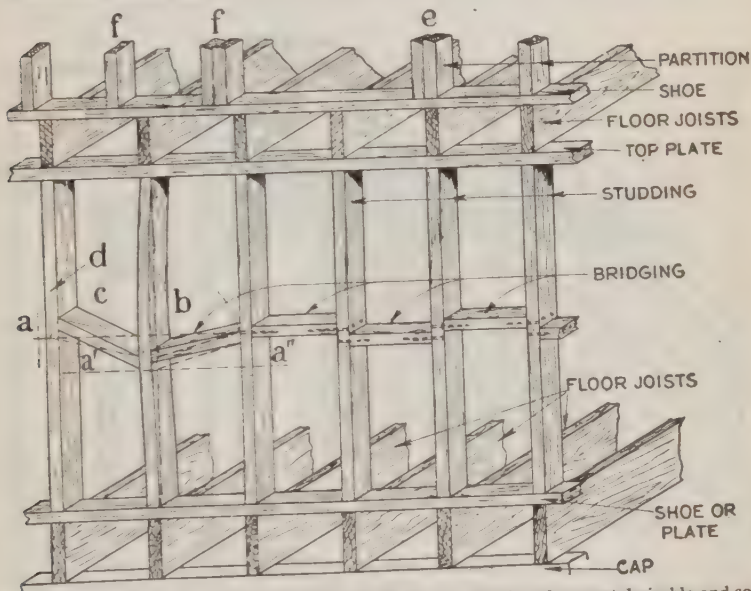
,893.—Partition running at right angles to joists, showing cheap yet desirable and common practice of stiffening with horizontal bridging cut from over lengths of studding set about midway between floor and ceiling. By inserting horizontal bridging, uniform spacing is readily secured. Assuming that lines have been struck on a level across the studs as *a a*, and that all cutting or bridging is cut to exact lengths, either for herringbone or linear; there is enough variation at times in the thickness of studs to distort their plumb line. When herringbone is used there is a tendency also to wedge when driving in and if care be not used in keeping to the line, allowing for variation, conditions as at *b* and *c* will occur. By it a percentage of support is lost and setting lath is affected. The curvature caused at *b* sends *c*, much above the line. To drive it down would cause a greater spring in stud *d*, the level of floor above it is also affected. When shoe or plate is thin and laid directly across joists without sub-flooring under, care should be taken to—as near as possible—have studs rest on shoe directly over joists as at *e*, rather than as at *f*.
